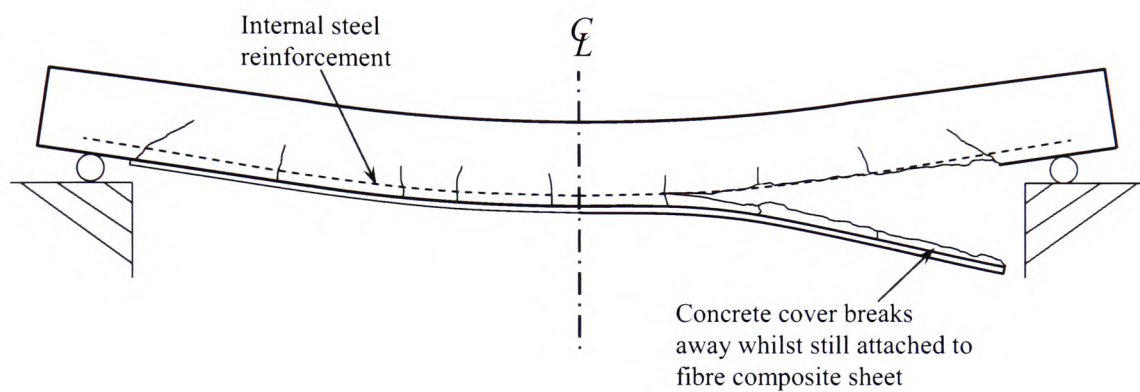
Diagram of tearing-off of concrete cover failure
